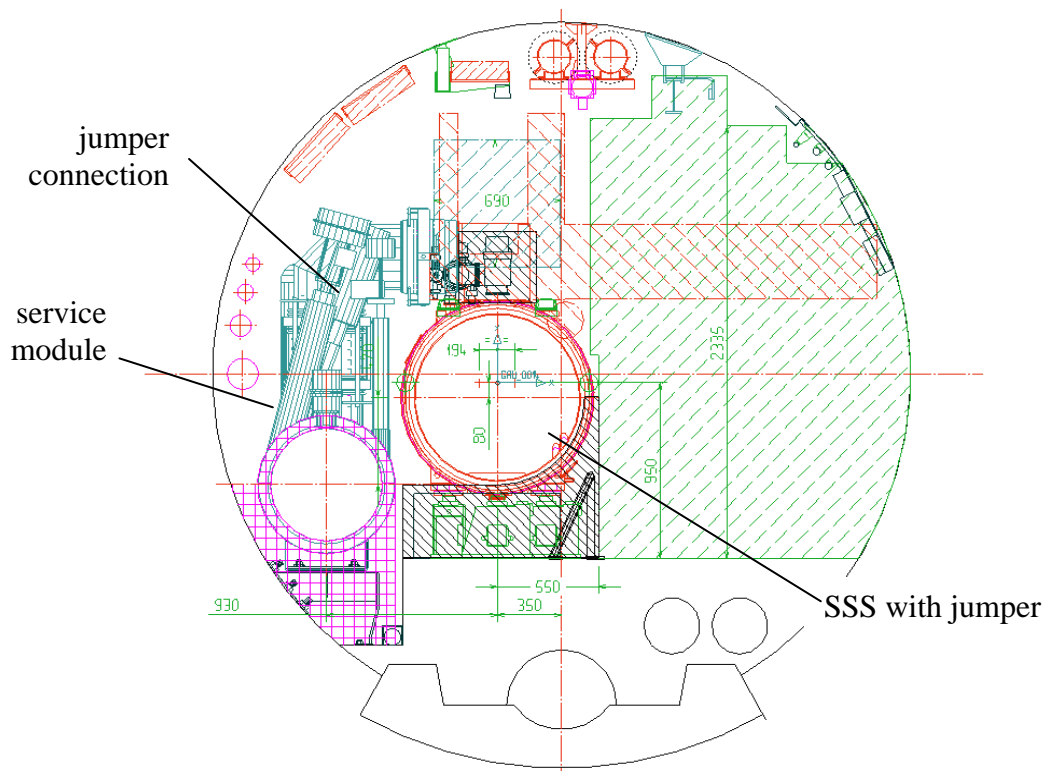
Standard tunnel cross section with jumper connection to the QRL
